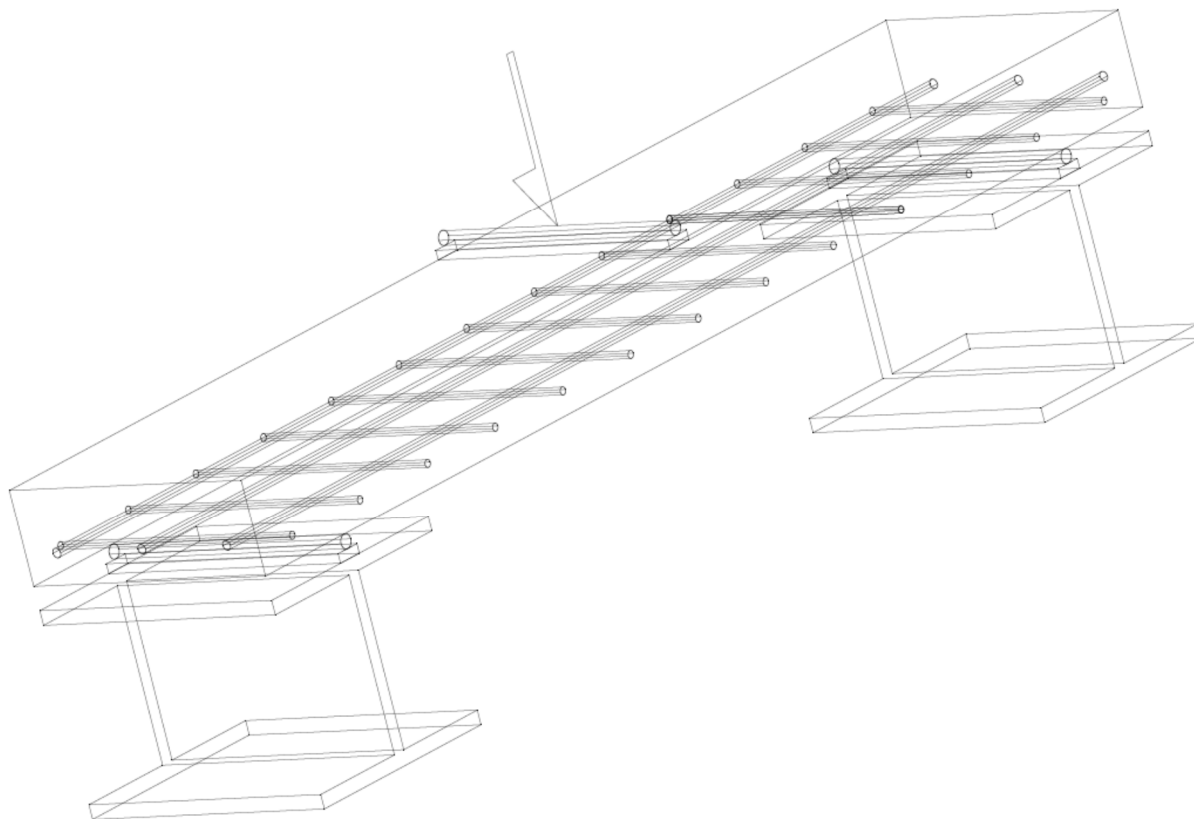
Detailed drawing for a tested beam reinforced with steel mesh
